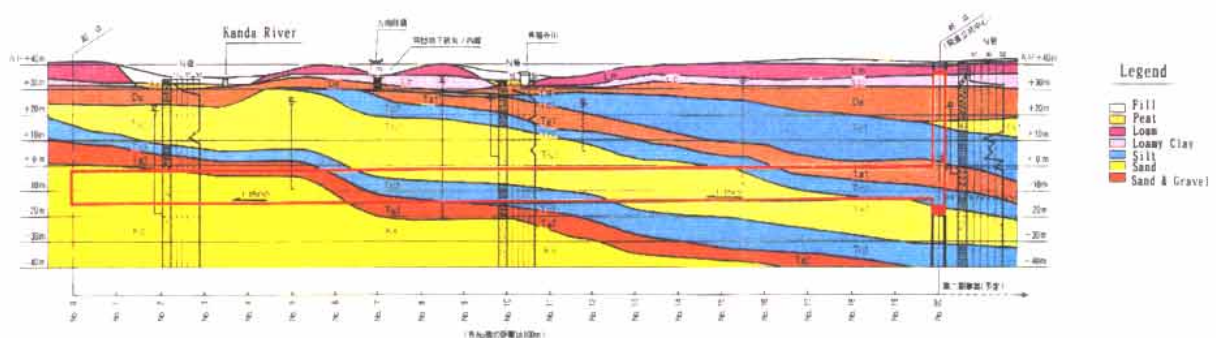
Soil Profile of Underground River beneath Loop Road No. 7
